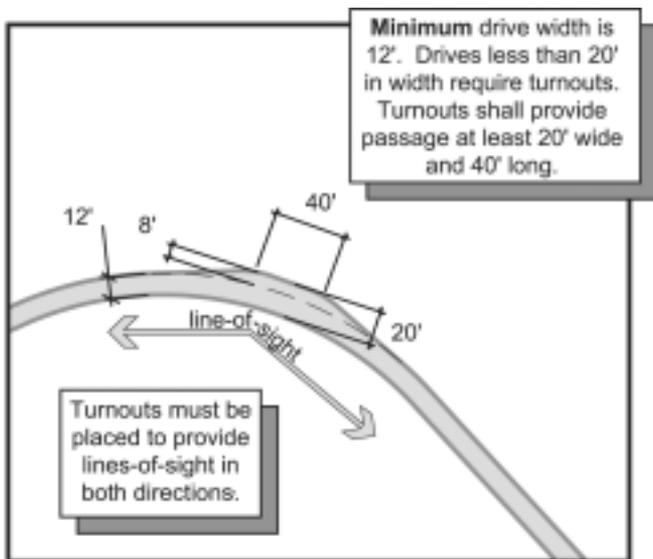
Minimum construction standards for access: turnout specifications (LCC 935.200).
